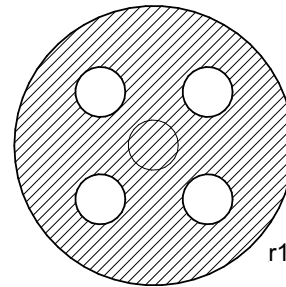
Cross section of a double U pipe with back-fill pipe
